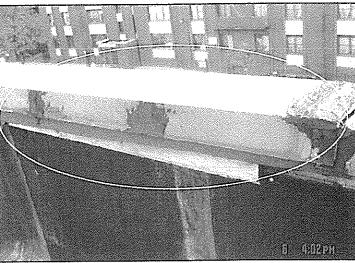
Facing east – large opening at aluminum cap joint for parapet.
